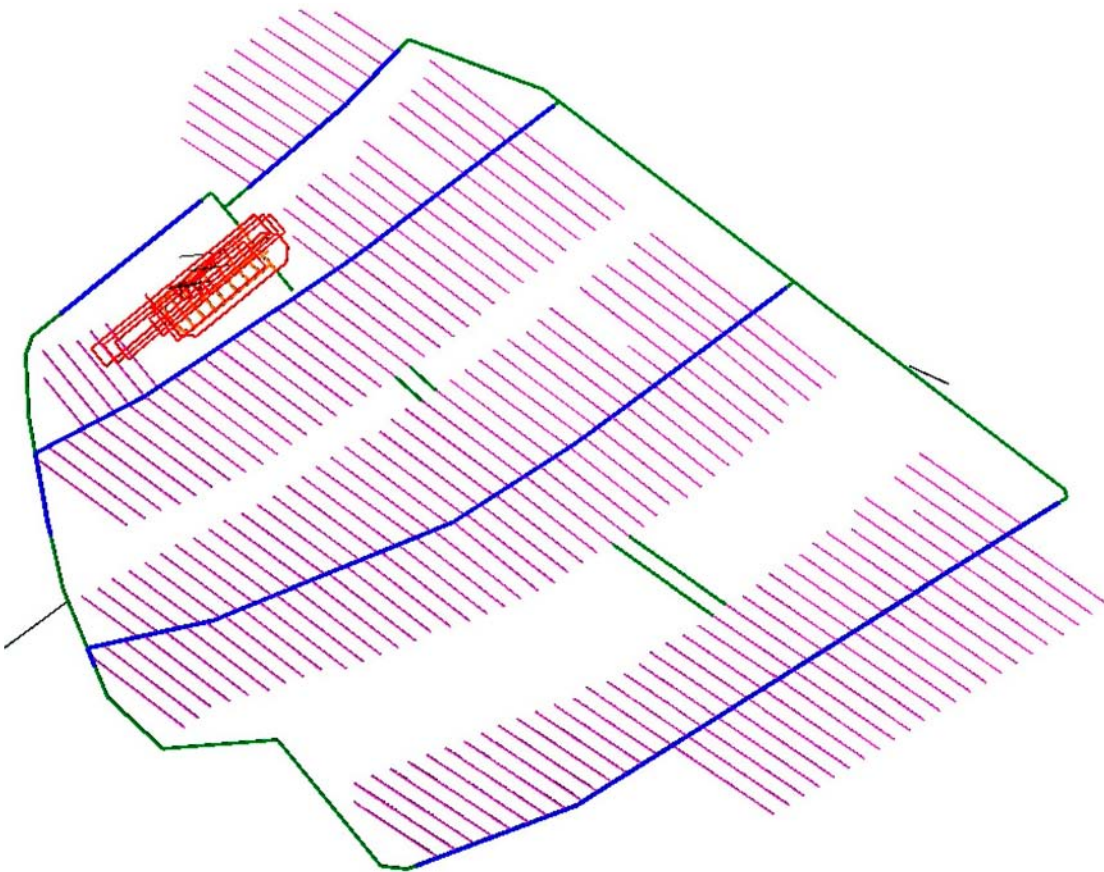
Representation of tunnels and excavation damaged zone (EDZ) in the site-scale model.
